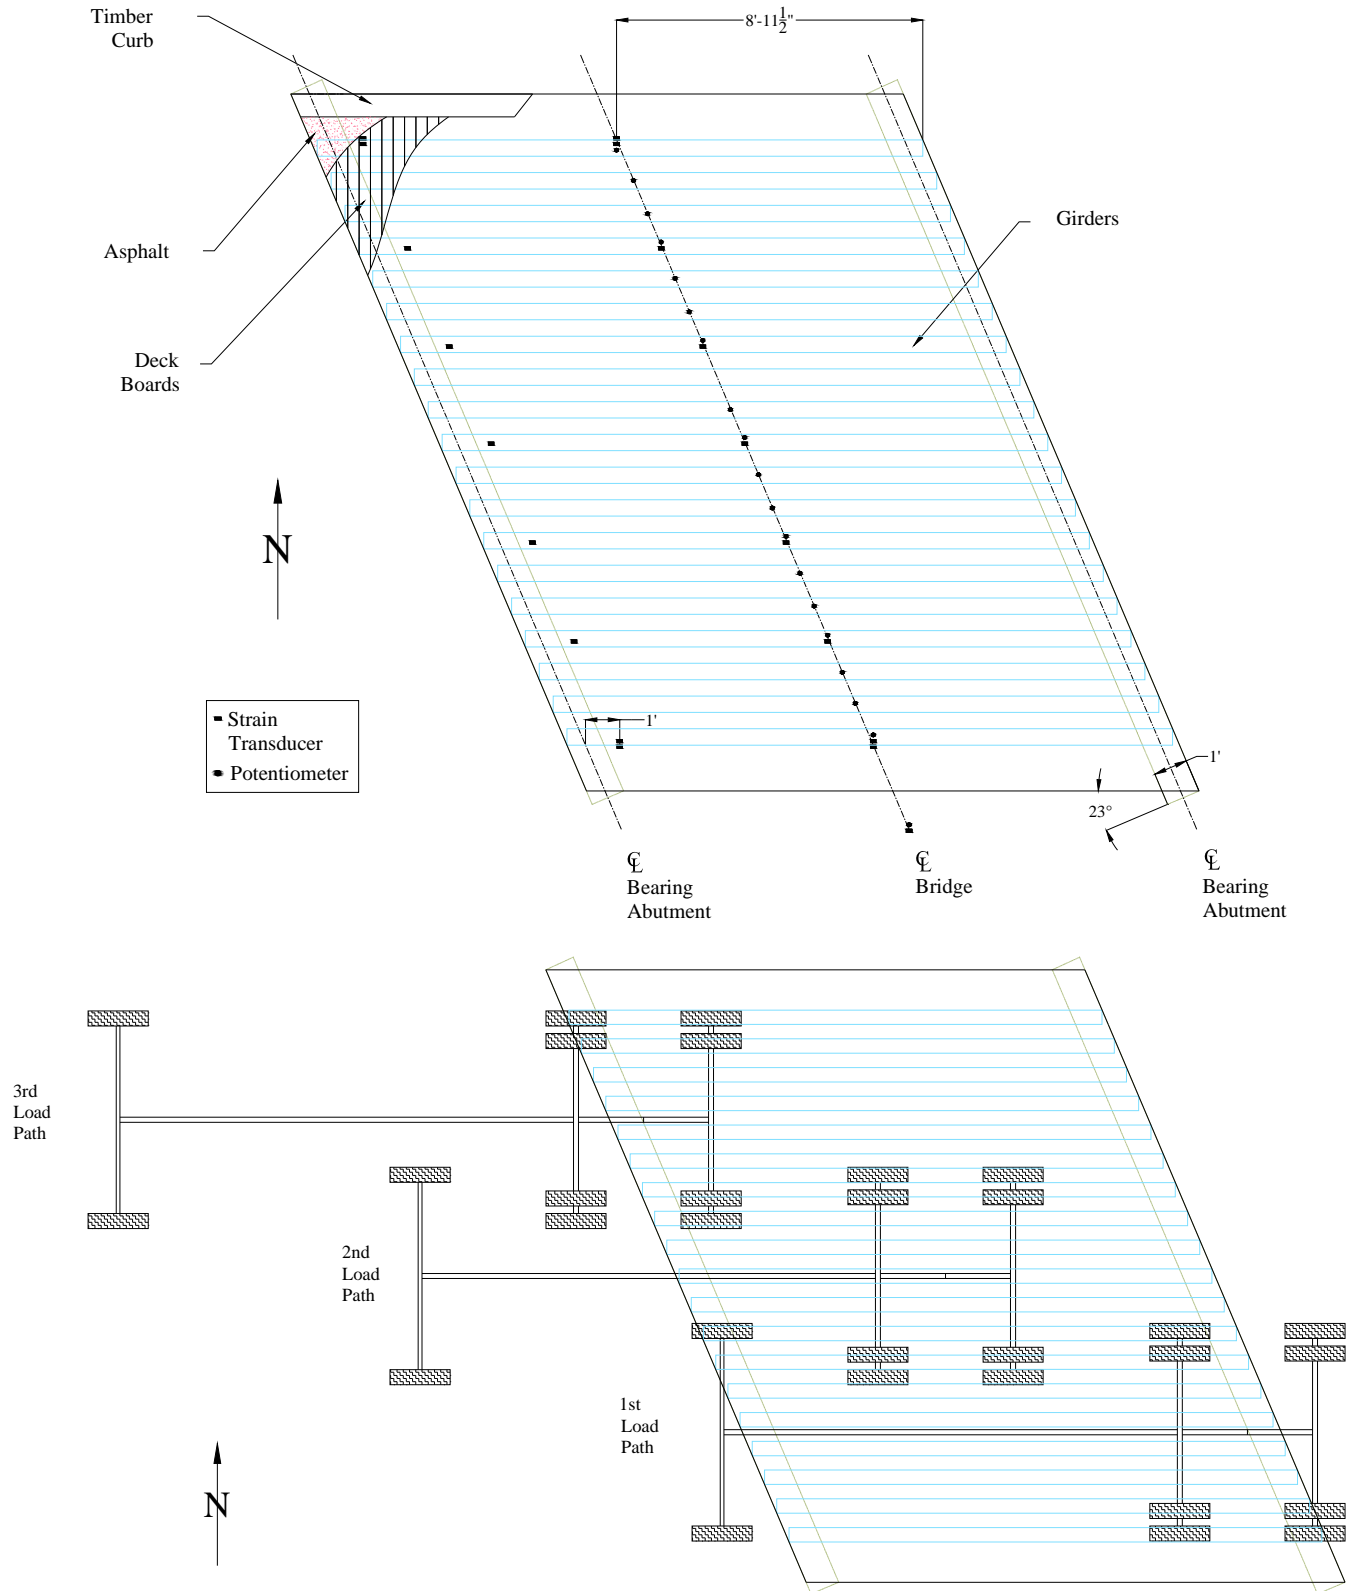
Instrumentation and Load Paths of McDowell County Bridge
